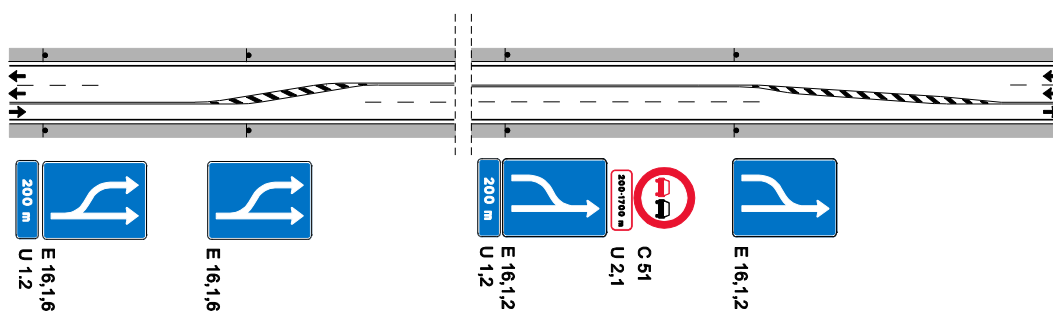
Road with three lanes and changing overtaking sections (2+1 solution). Signs are only provided for one direction
